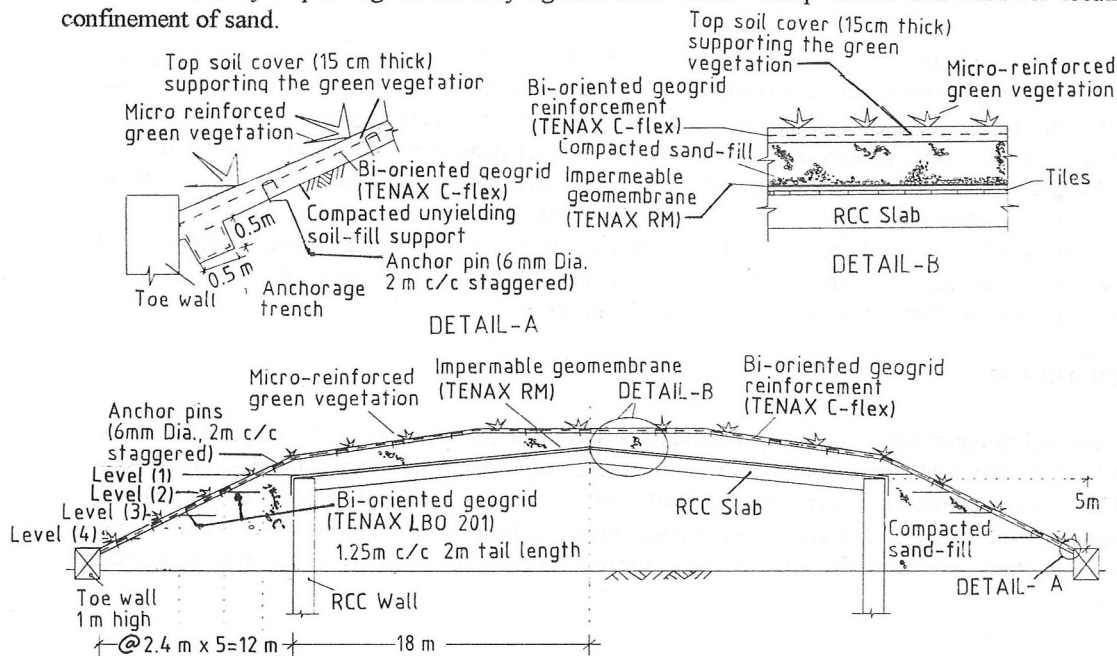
DRAWING SHOWING TYPICAL DETAILS OF THE PROJECT
